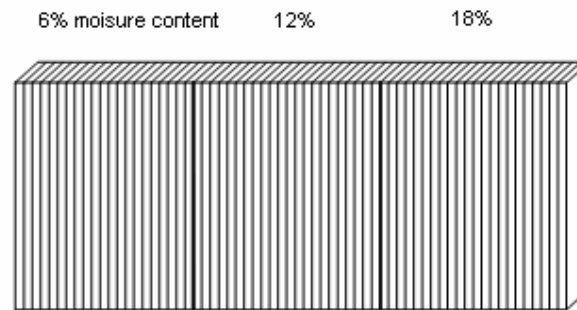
Timber wall (2,6 m x 1 m) containing standing cross bars of dimension (140 mm x 40 mm)
